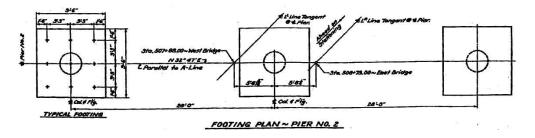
Bridge 5/649 Footing Detail
